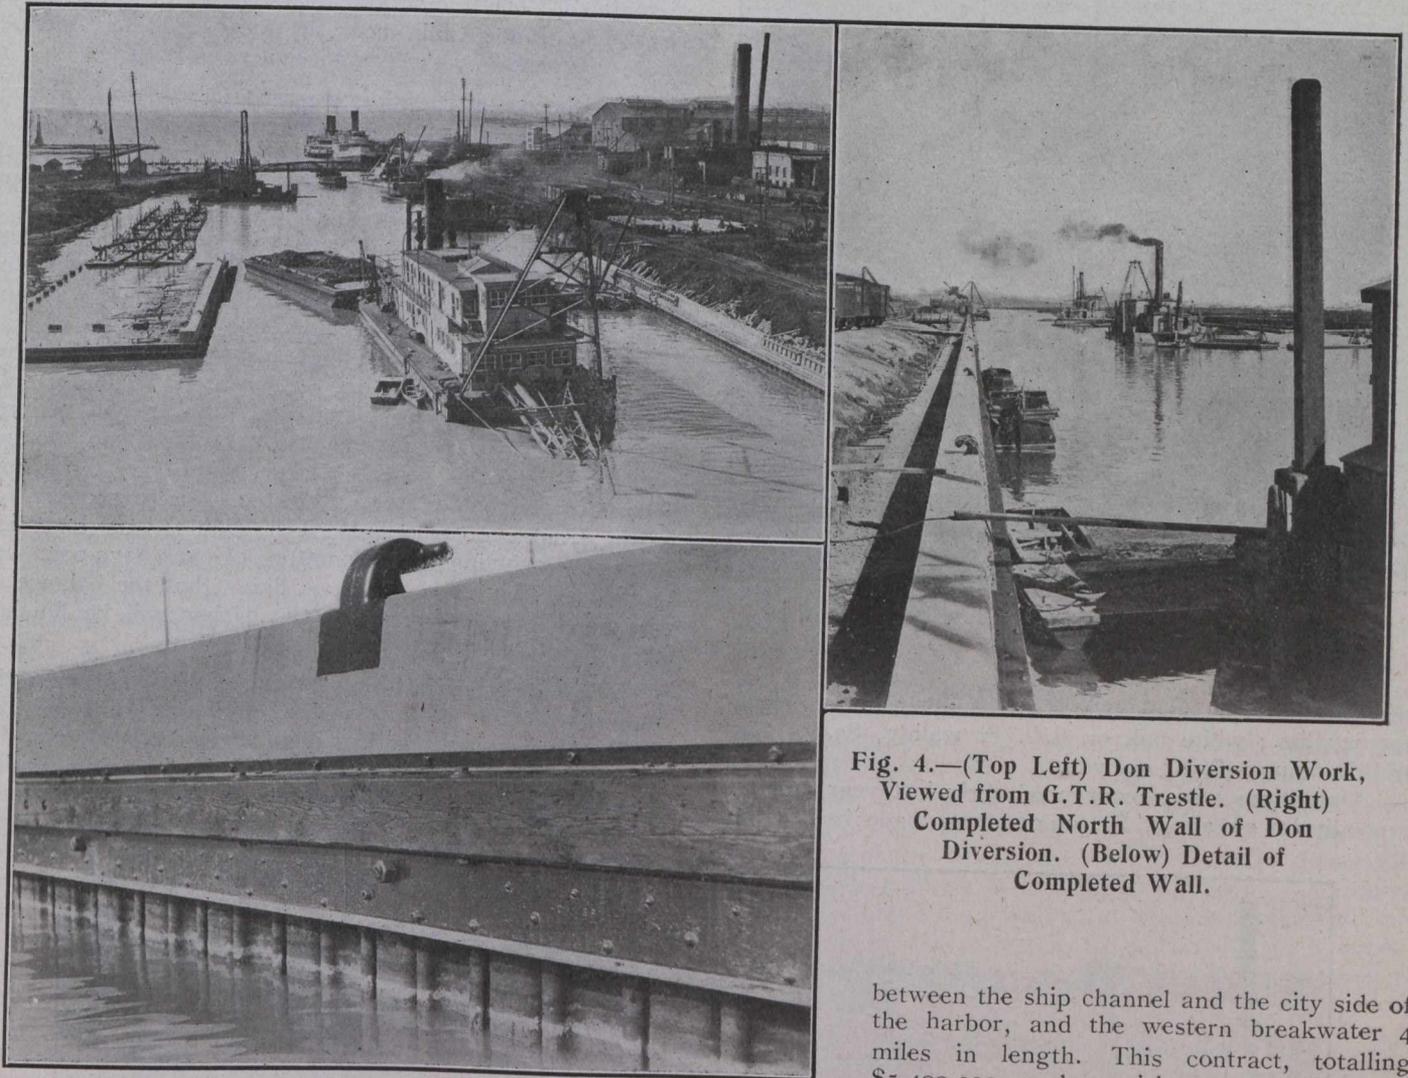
(Top Left) Don Diversion Work, Viewed from G.T.R. Trestle. (Right) Completed North Wall of Don Diversion. (Below) Detail of Completed Wall.
